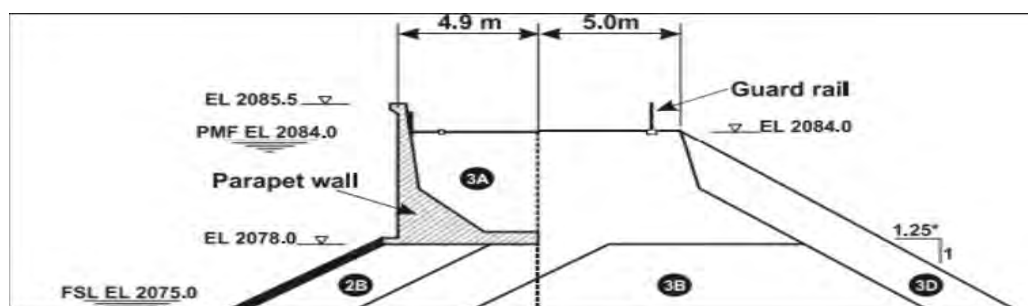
Parapet wall of Mohale Dam (Sundaram and Kleiner, 2005)
